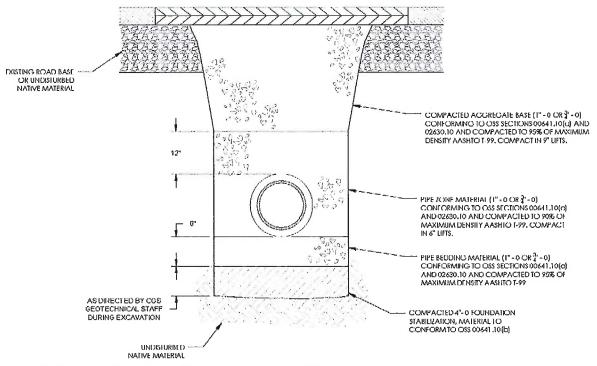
Trench in ROW, Under Structure or Pavement, Etc.
